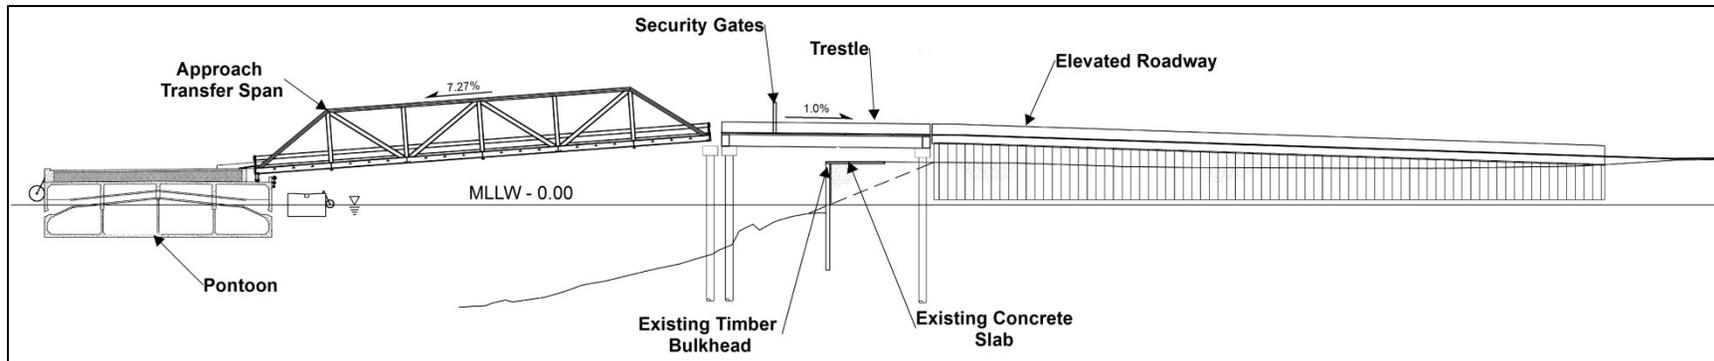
Alternative 2 – Trestle, Transfer Span, and Floating Pontoon
